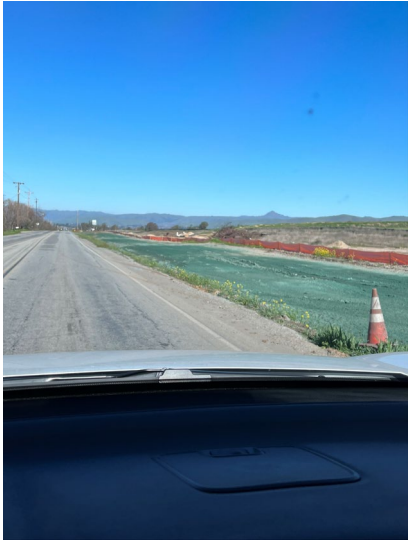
(pictured left) Hillcrest Rd. at Fairview Rd. Hydroseed and silt fence for erosion and sediment control. Improvements to existing natural drainage adjacent to Fairview.
